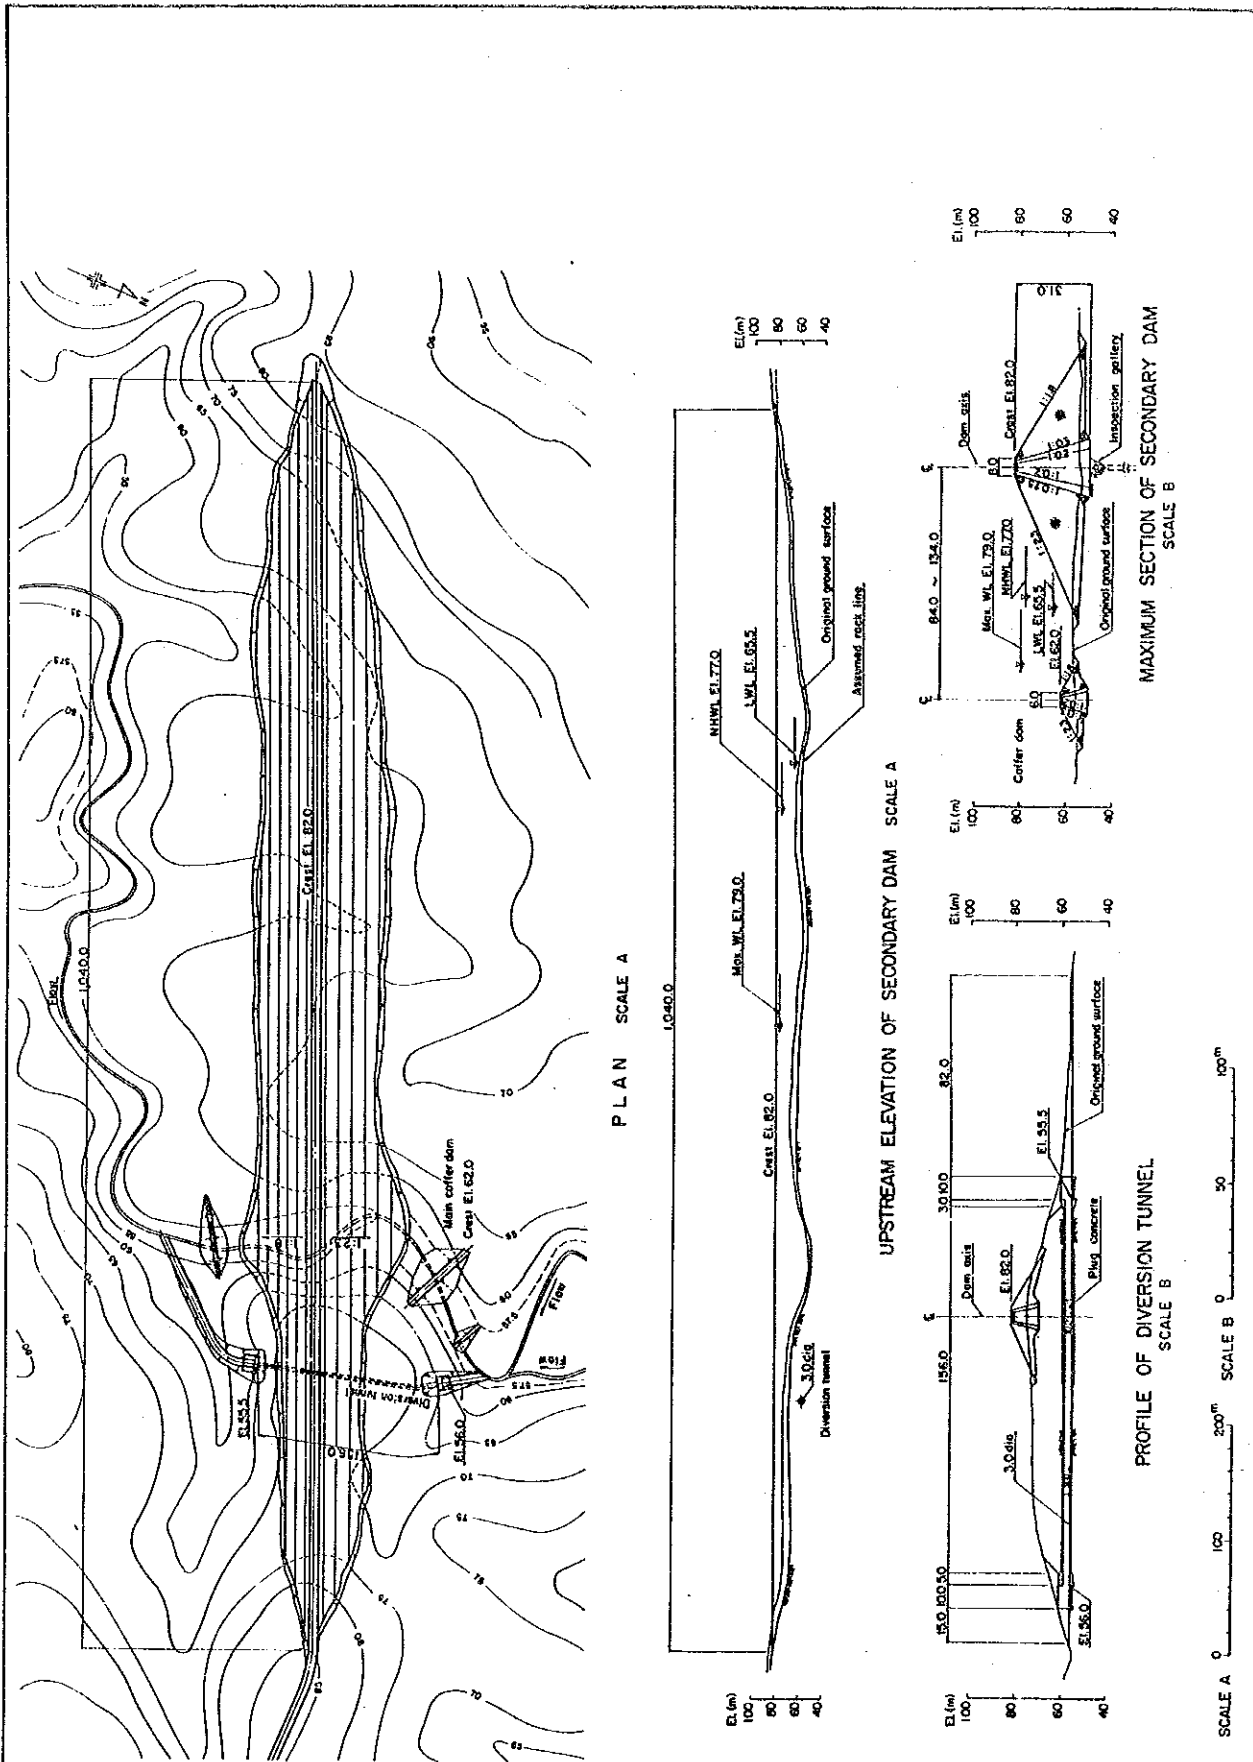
Plan, Elevation, Profile and Section of Tawar-Muda Dam (2/2)
